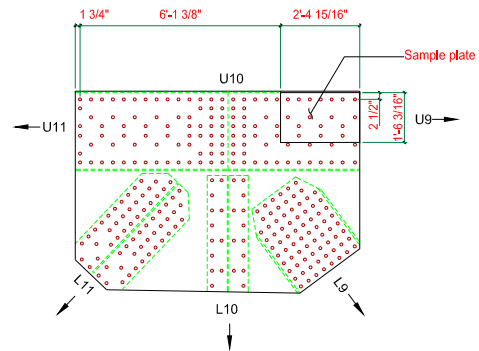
Location of Specimens on U10 East Truss, West Side Gusset Plate.
